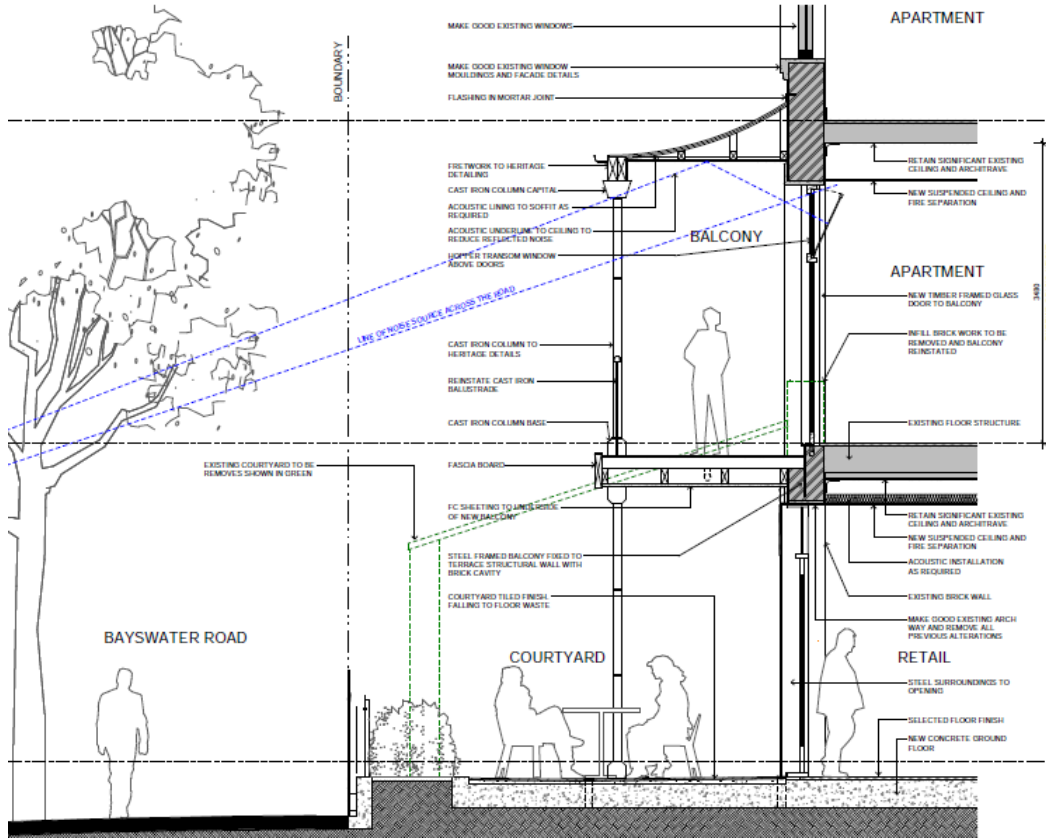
Section plan showing proposed acoustic attenuation to the terraces
